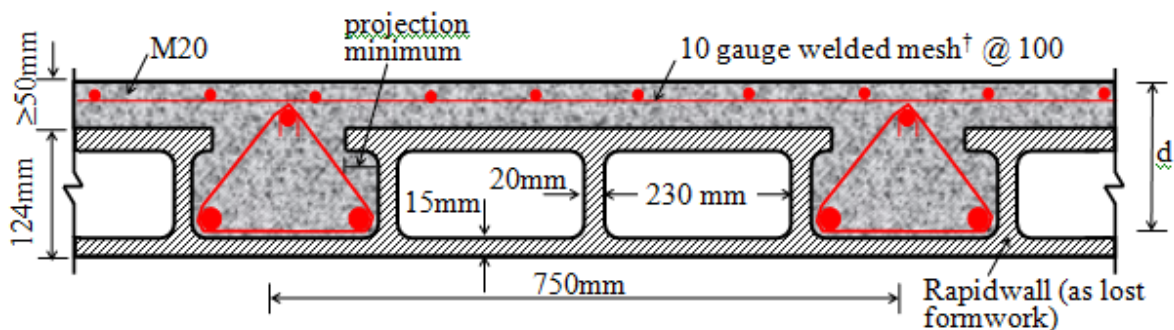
Cross-section of GFRG slab panel (every 3rd cavity reinforced)
